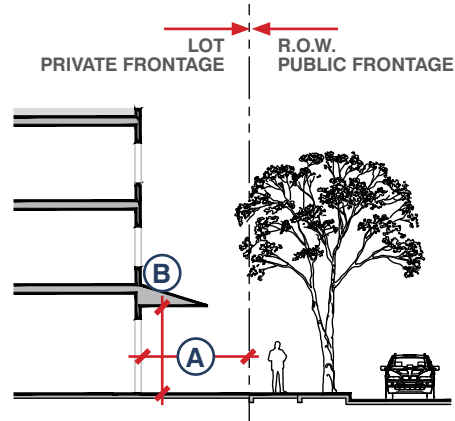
RESIDENTIAL ACCESSORY USE FRONTAGE SECTION
